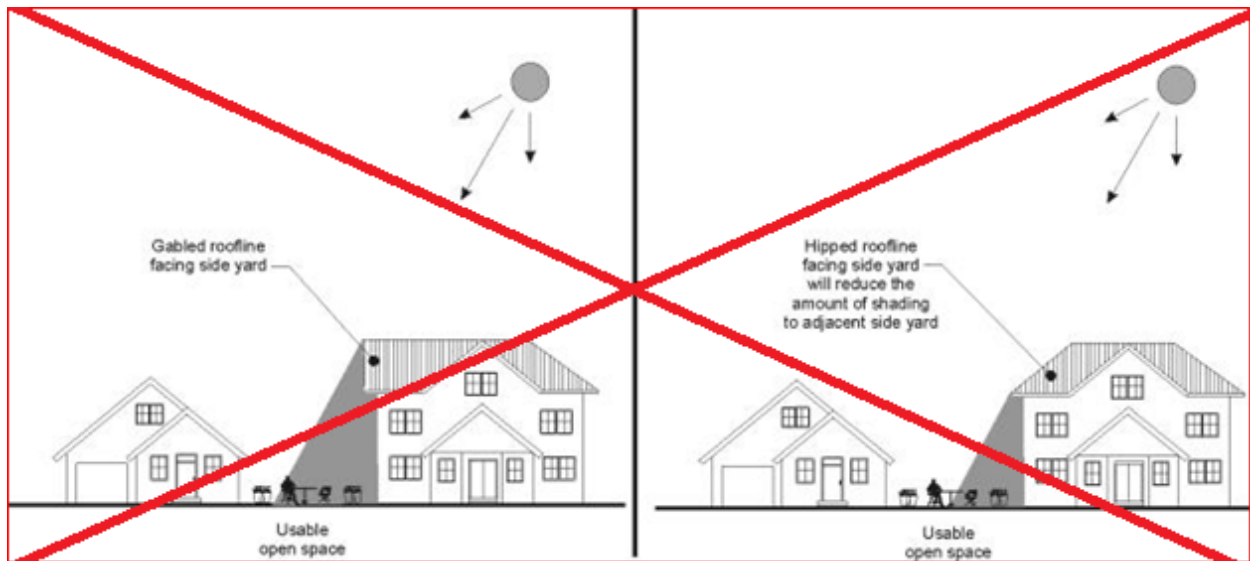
Encourage rooflines along the side yard that maximize solar access to adjacent homes and/or private open space.
